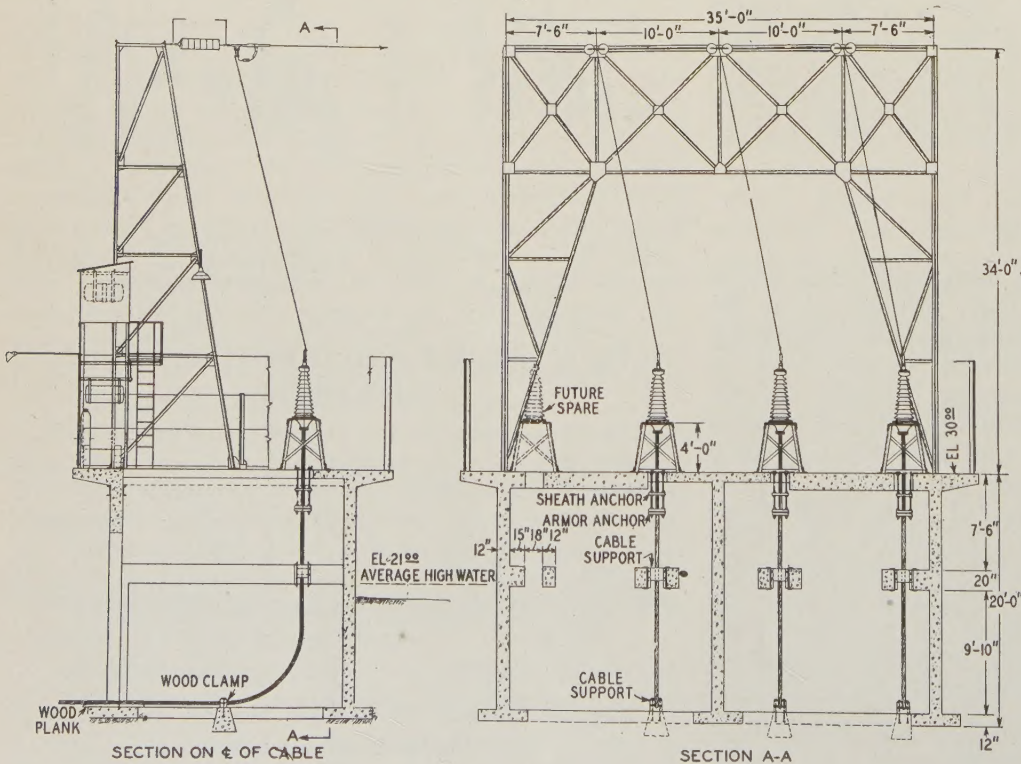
Details of 132-kv terminal for single conductor oil filled cable
